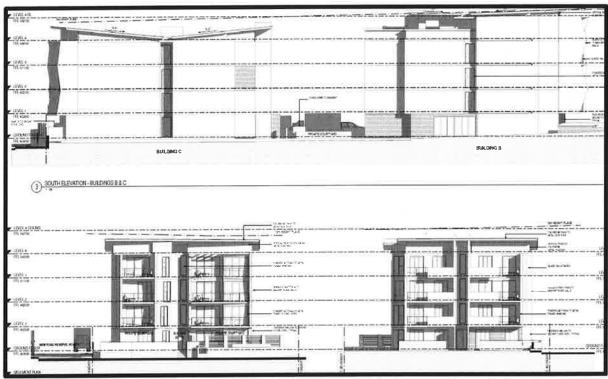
South Elevation Building B and C & East/West Elevation Building C
